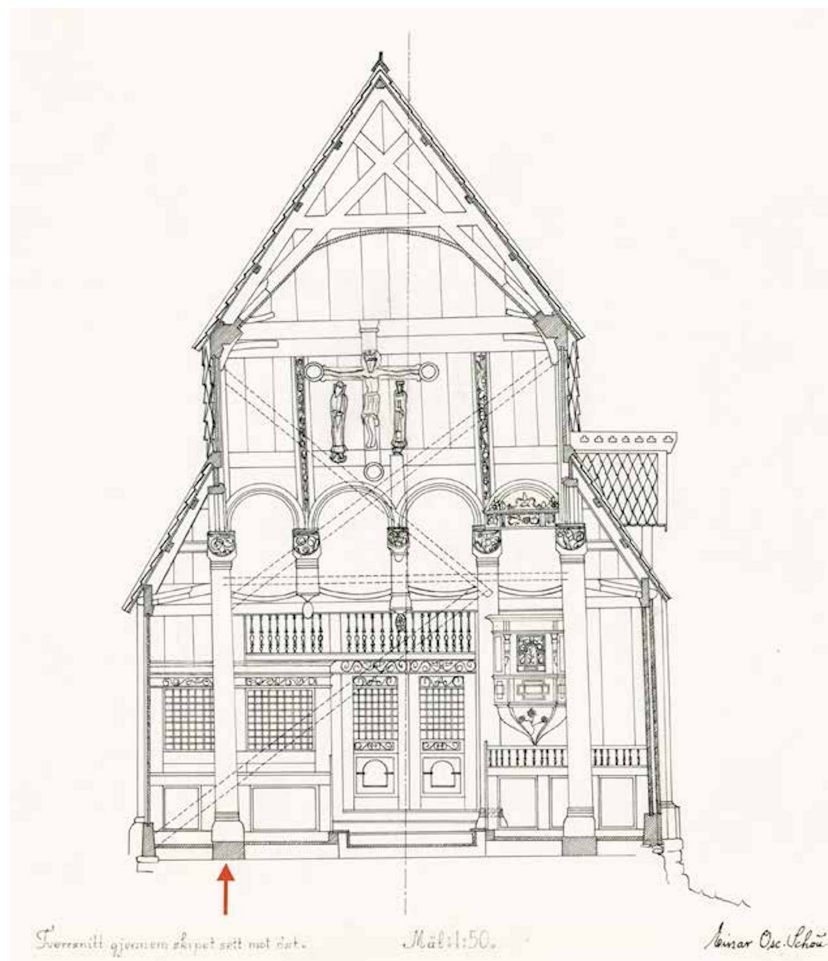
Section of Urnes stave church, subsidence on the church's north side is indicated by a red arrow (Source: Bakken K., Preserving the Stave Churches, 2016. P34)
